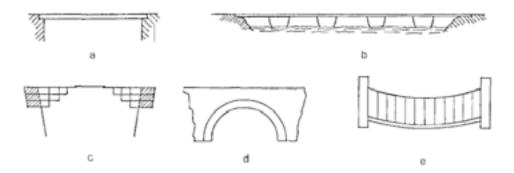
Types of bridge: (a) beam; (b) pontoon; (c) cantilever; (d) arch; (e) suspension.
